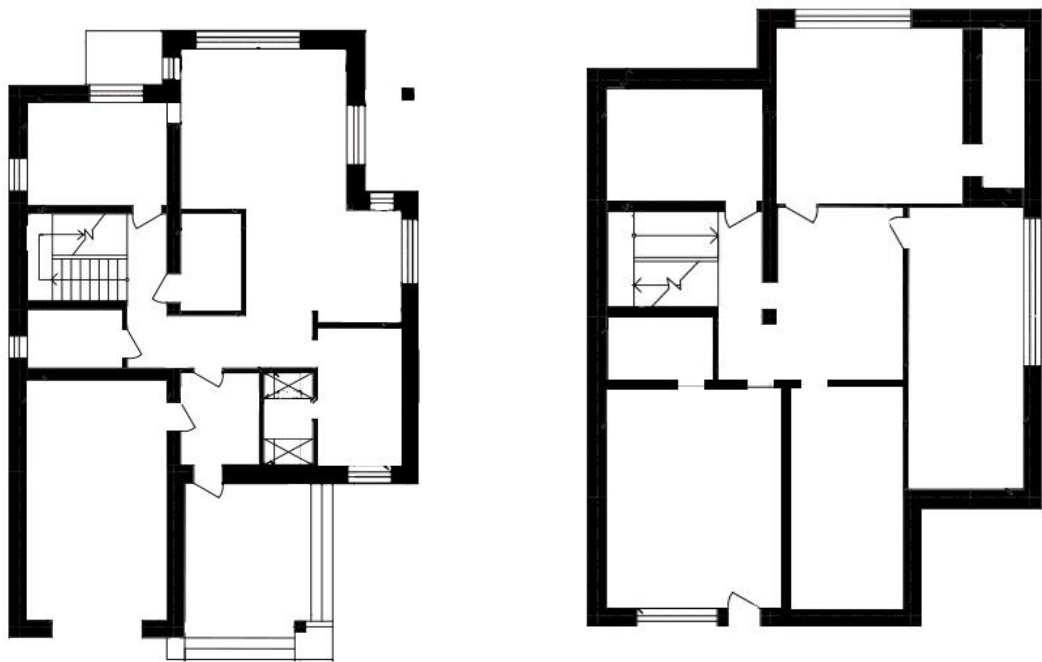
House plan (1st and 2nd floor, respectively)
